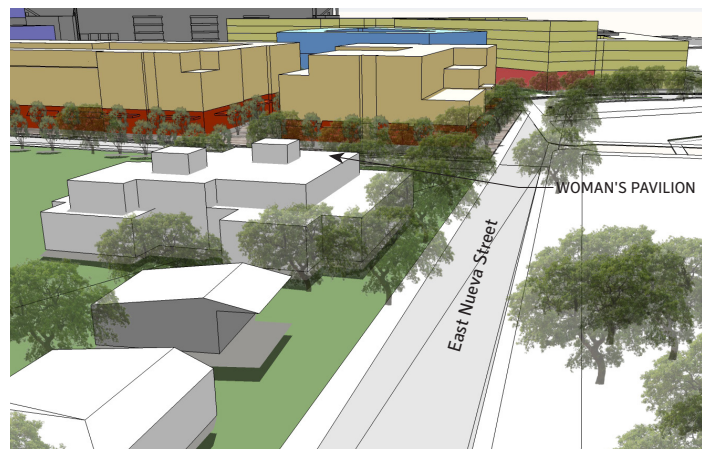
View from Tower Park Towards Parcel 6b
